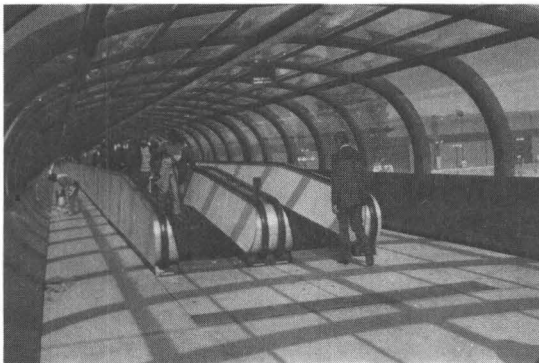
Enclosed footbridge complex at the new fair and exhibition site, Düsseldorf ; view in main tube with moving walkway
